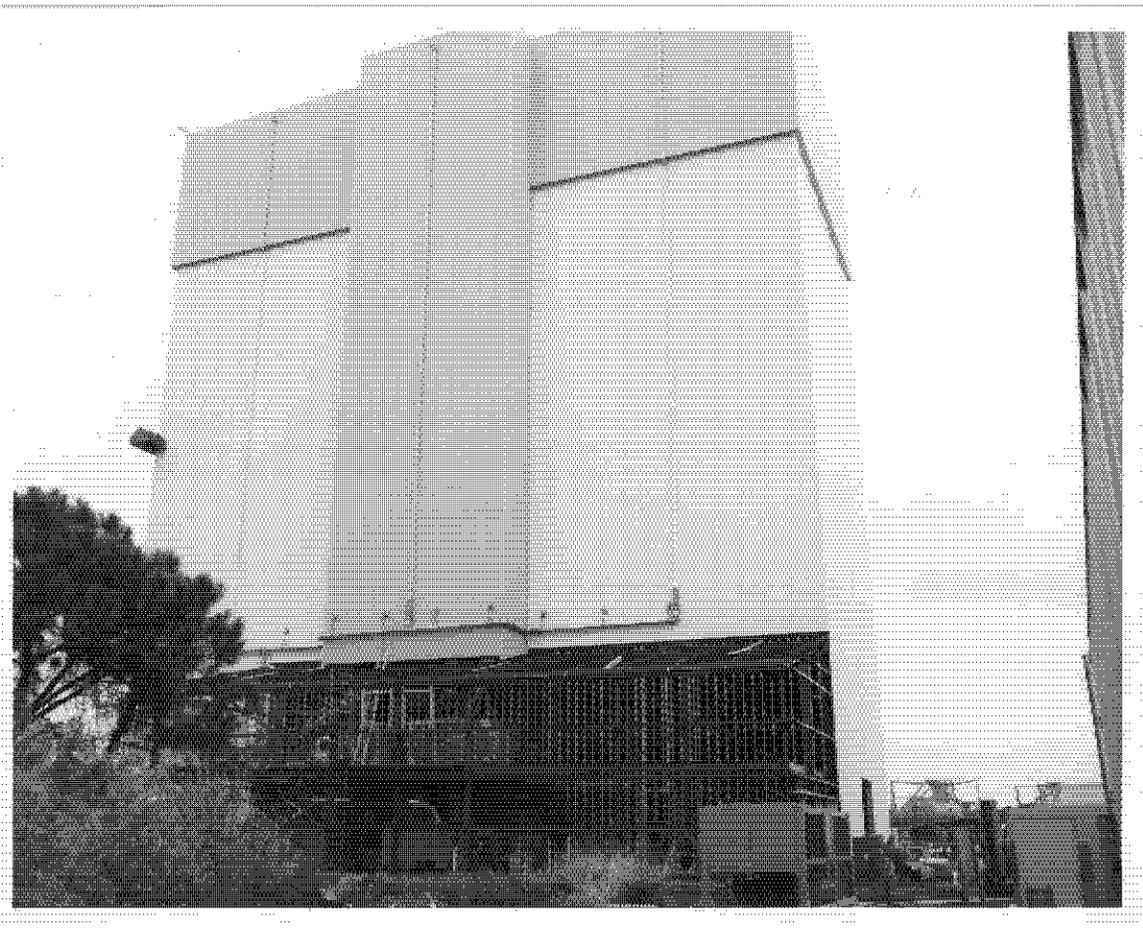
View of CRF, showing completed exterior walls and steel skeleton of the mechanical building to the north, camera facing southeast, January 24, 1992.
